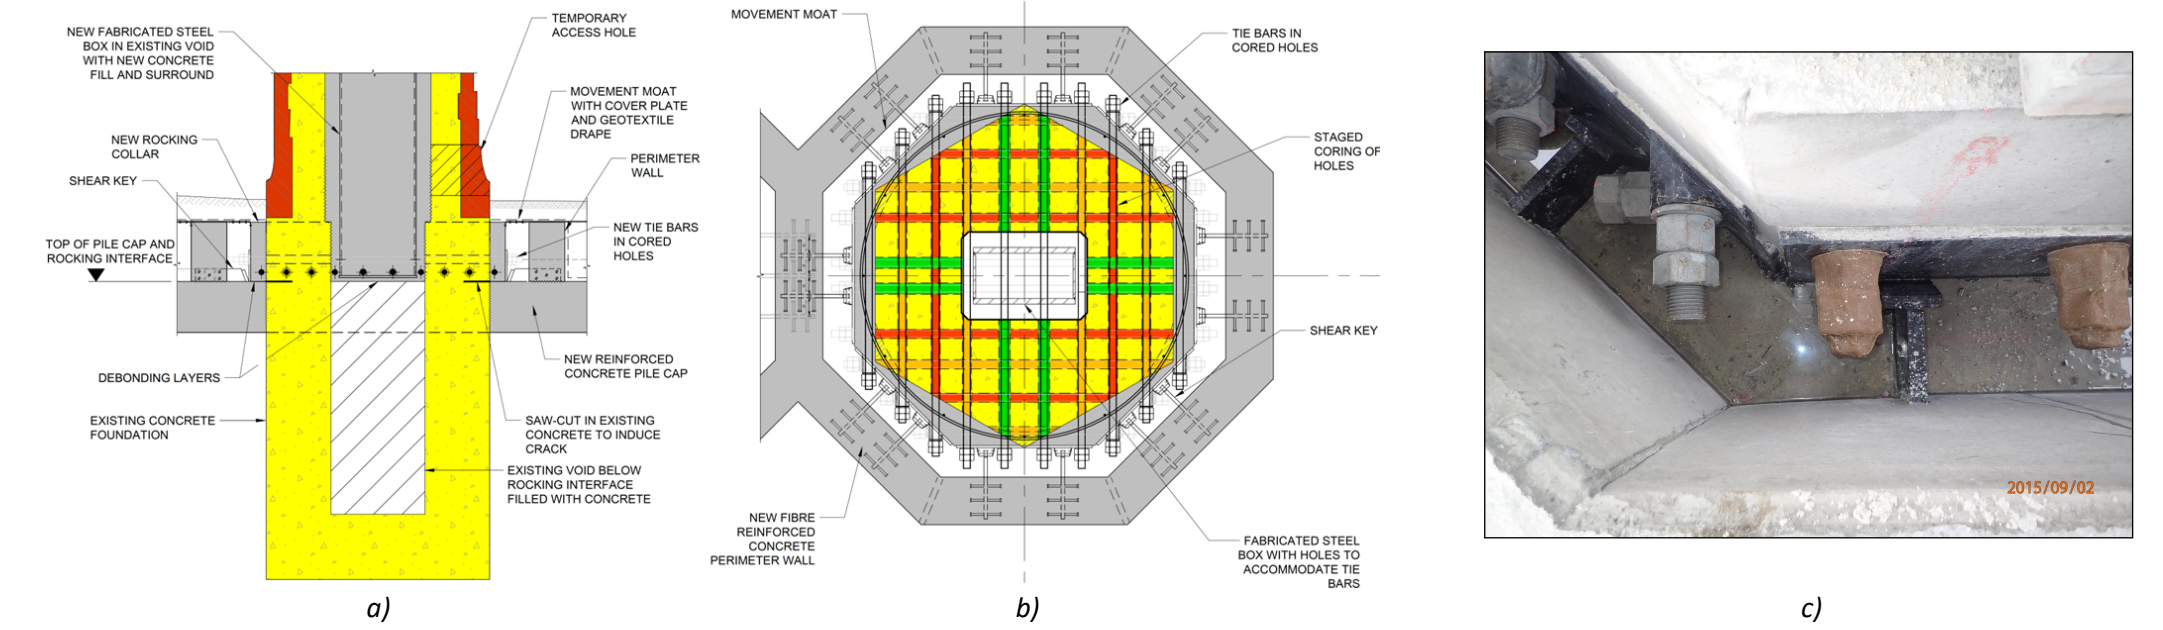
a) Section through strengthened column showing shear keys, perimeter wall and rocking collar tie-bars; b) Plan showing the same; c) Photo within movement moat showing shear keys and rocking collar tie-bars
